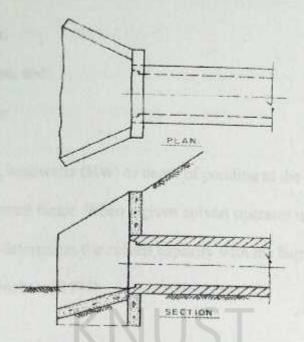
Inlet of pipe culvert with headwall and wingwall [Drainage Criteria Manual (Kelly, 2001)]
